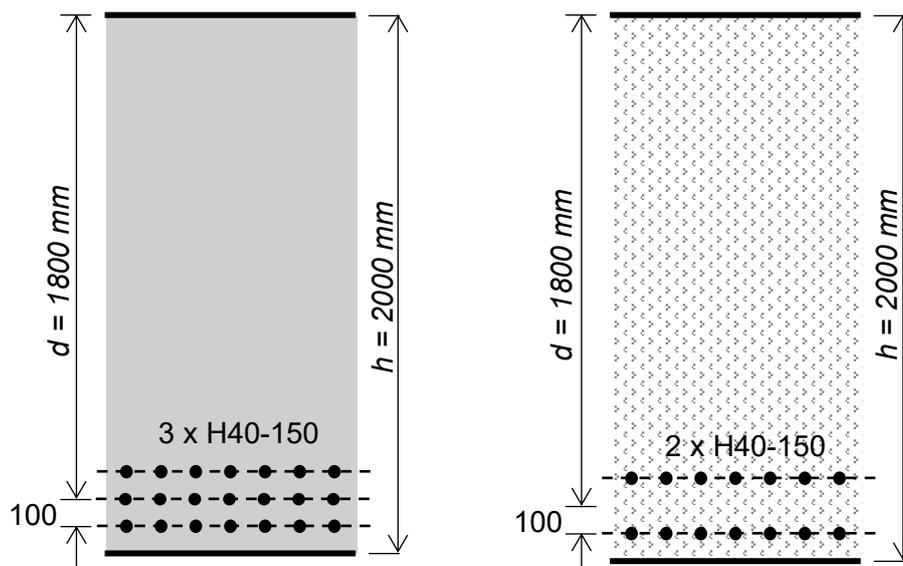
Original Section (Left) versus SFRC Section (Right)
